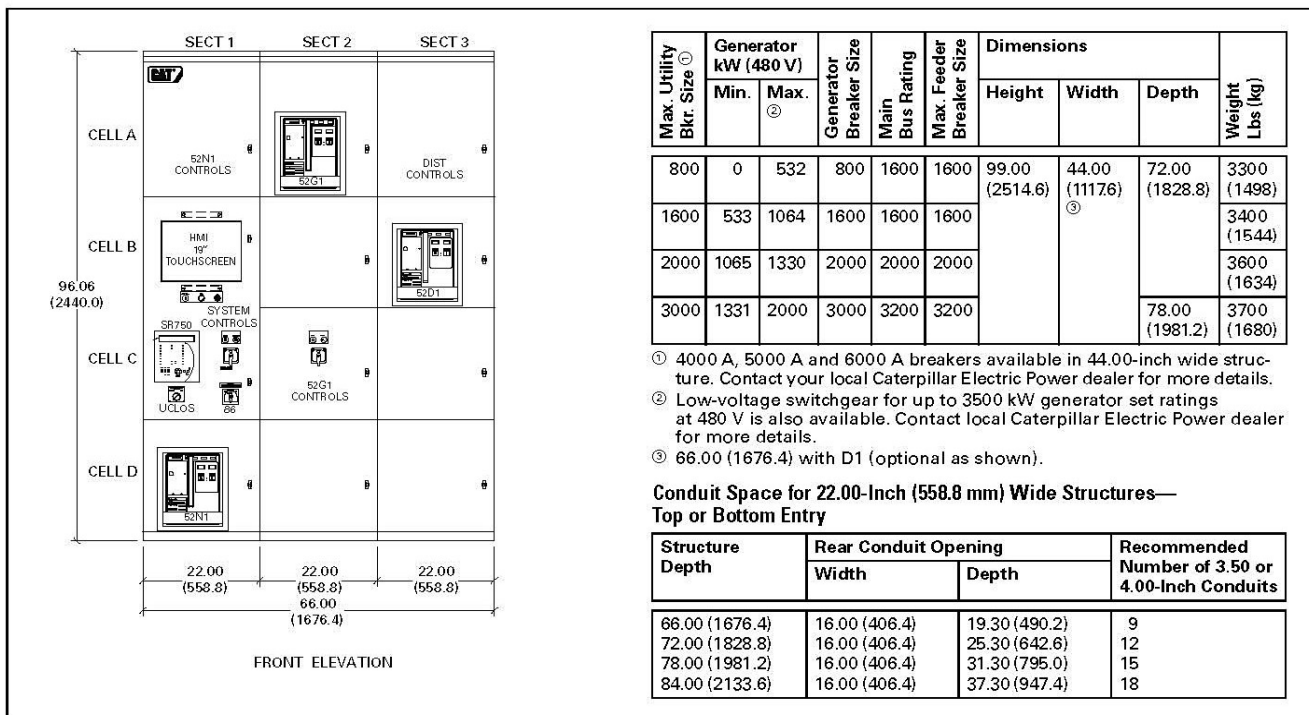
XLM1 Low-Voltage Switchgear Layout (UL1558)
